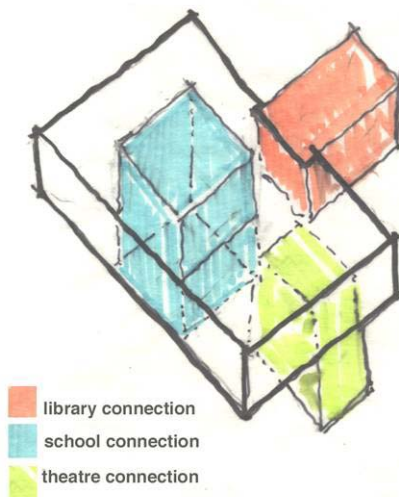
Public School 90 – Entry 1 plan showing lobby connection
